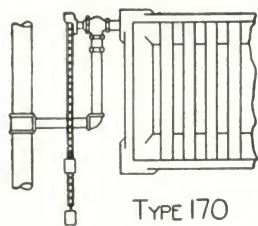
A. Typical for Wall Radiator Suspended from Ceiling
